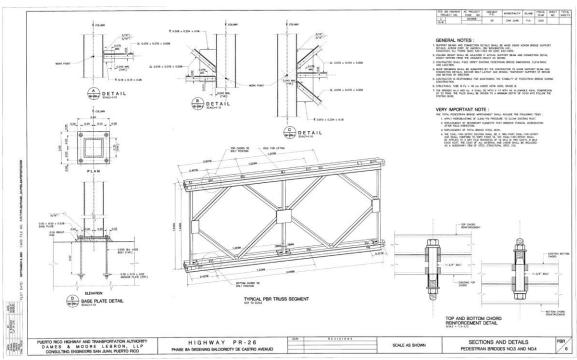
Bridge Drawings 2001 – Sheet 6
